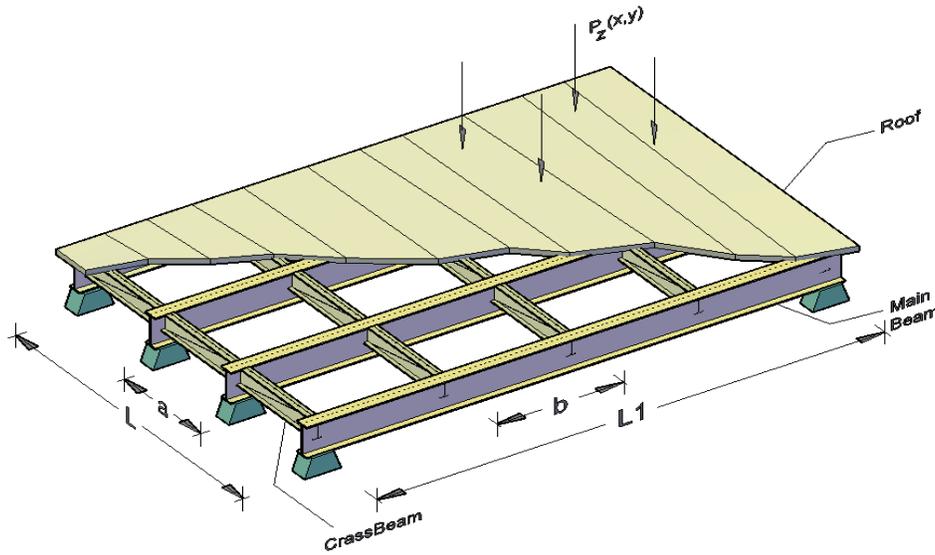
(a): Girders in roof systems, cross beam reactions on the main beam (main girders)
